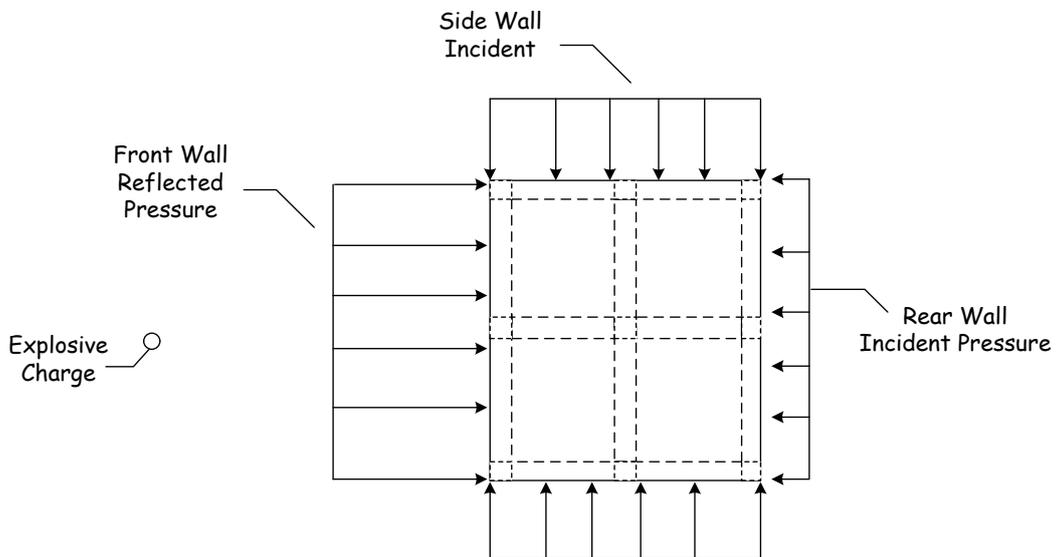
Plan Diagram of Typical Structural Model Peak Blast Loading Interaction
